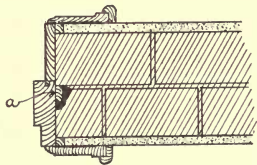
SETTING A DOOR-FRAME IN BRICKWORK.
